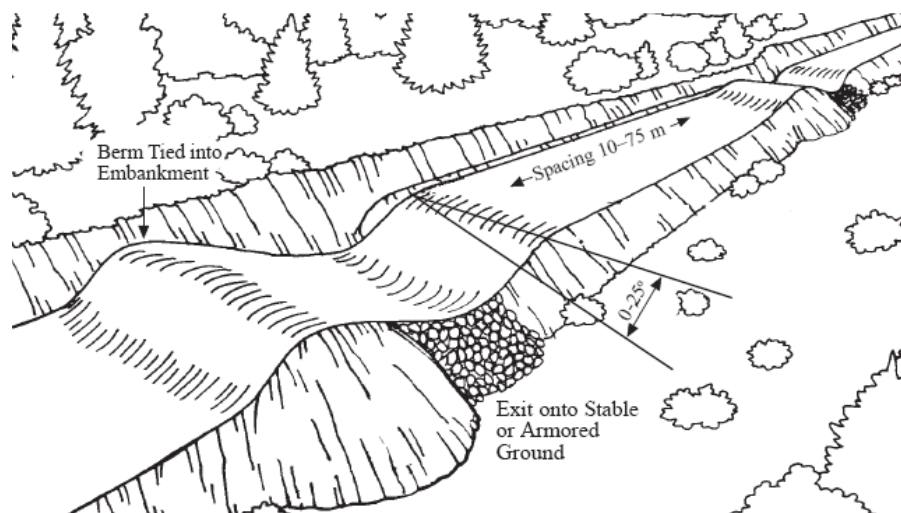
Cut-out (water-bar) installed on track to control stormwater runoff (Visser, 2018b)
